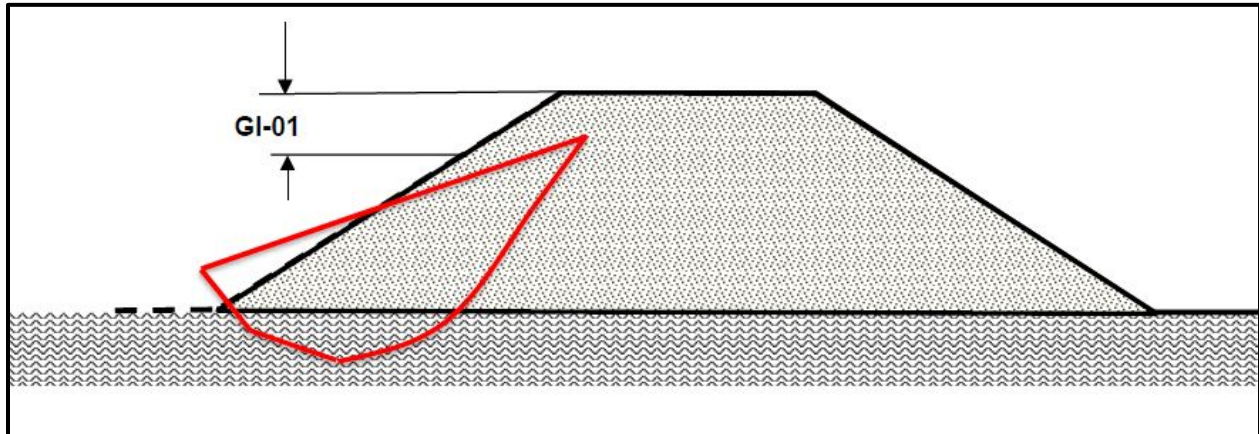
, Embankment Circular Instability at Bridge End Bent
